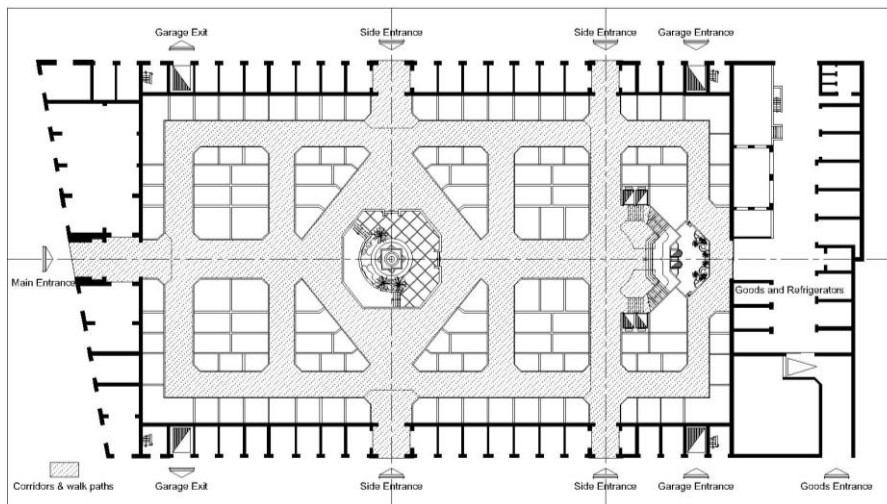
Proposed Ground Floor Plan. Source, Researcher
